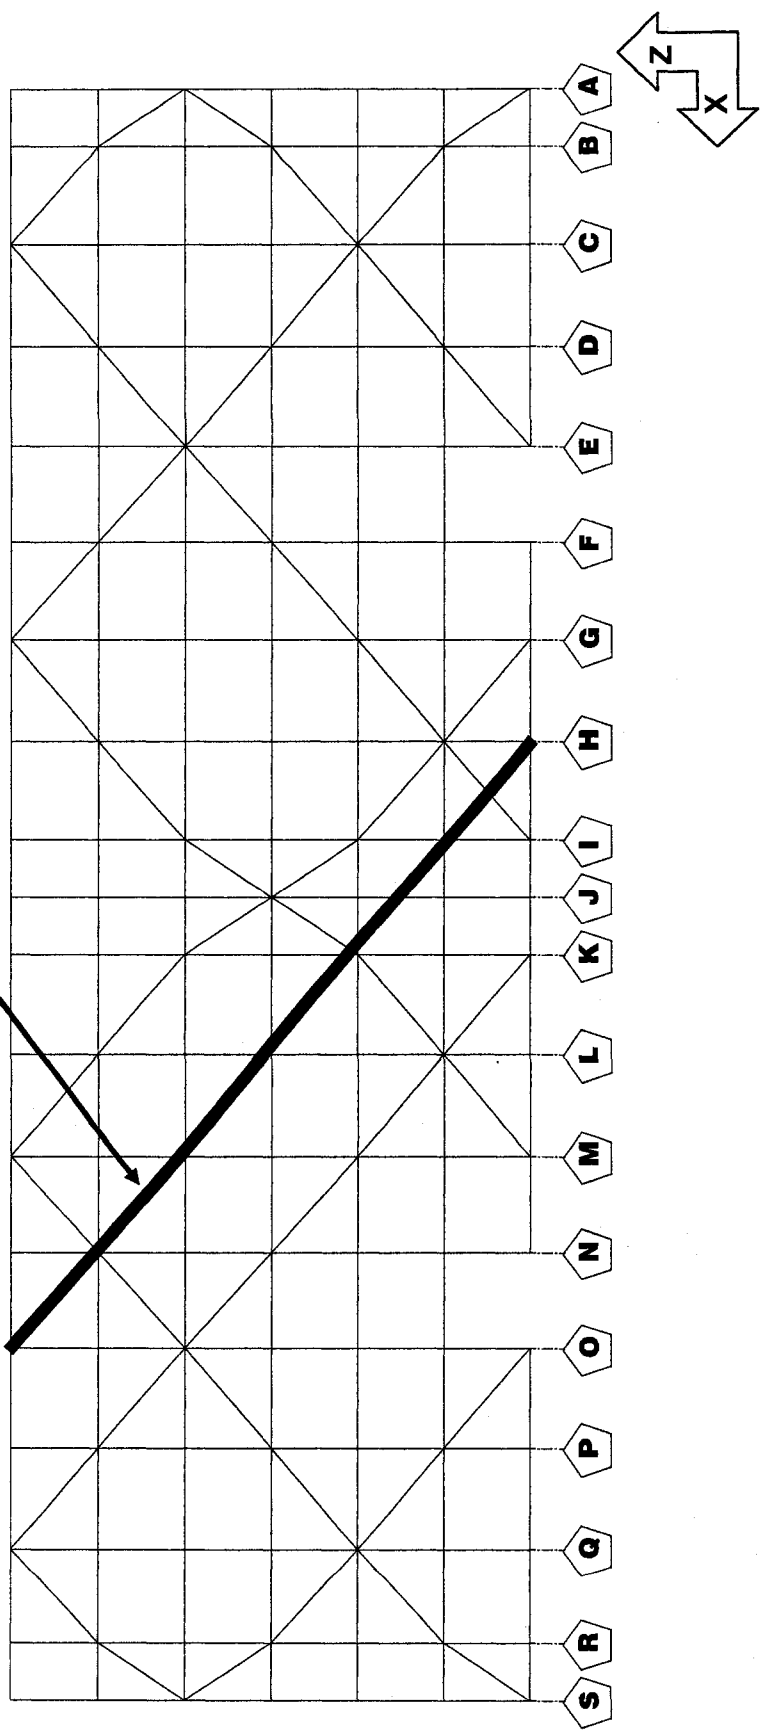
Rear cross section showing line to LVDT to measure side-side sway
